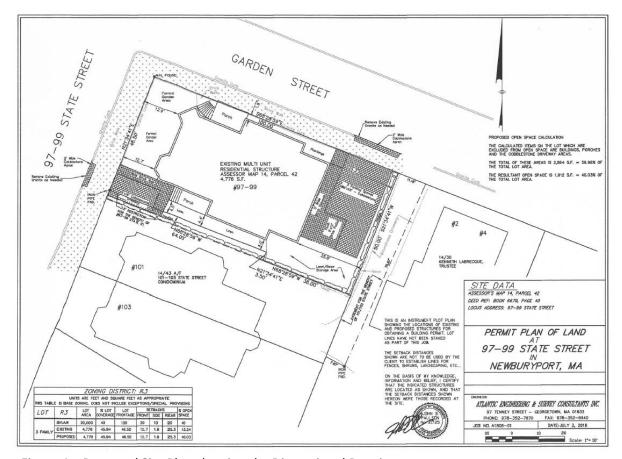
Proposed Site Plan showing the Dimensional Requirements
